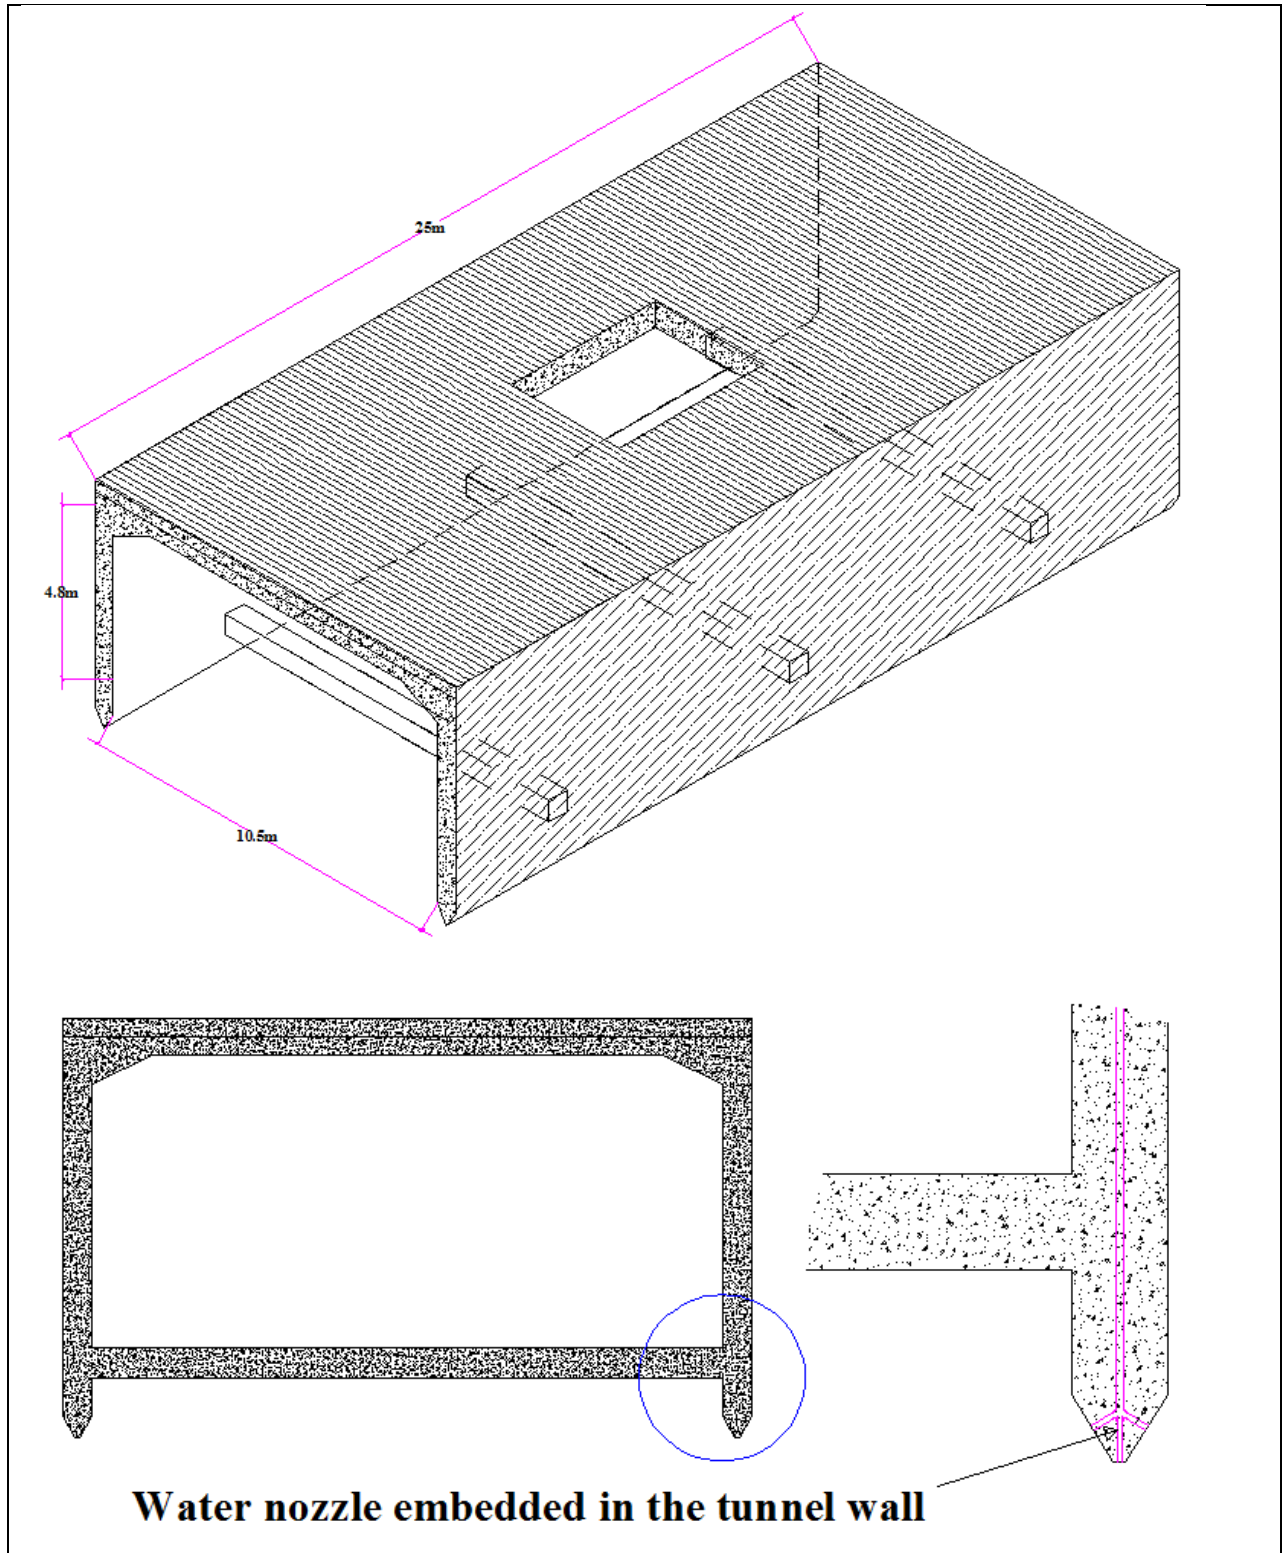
Geometry and dimension of a single section of caisson tunnel
